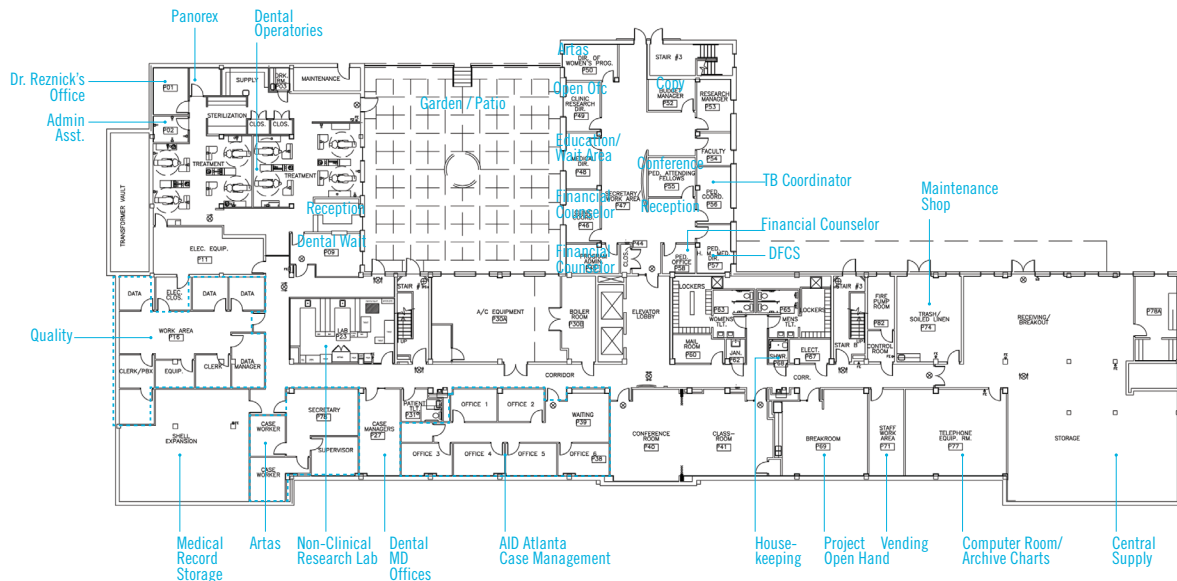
Updated floor plan for the patio level of the Ponce de Leon Center.
